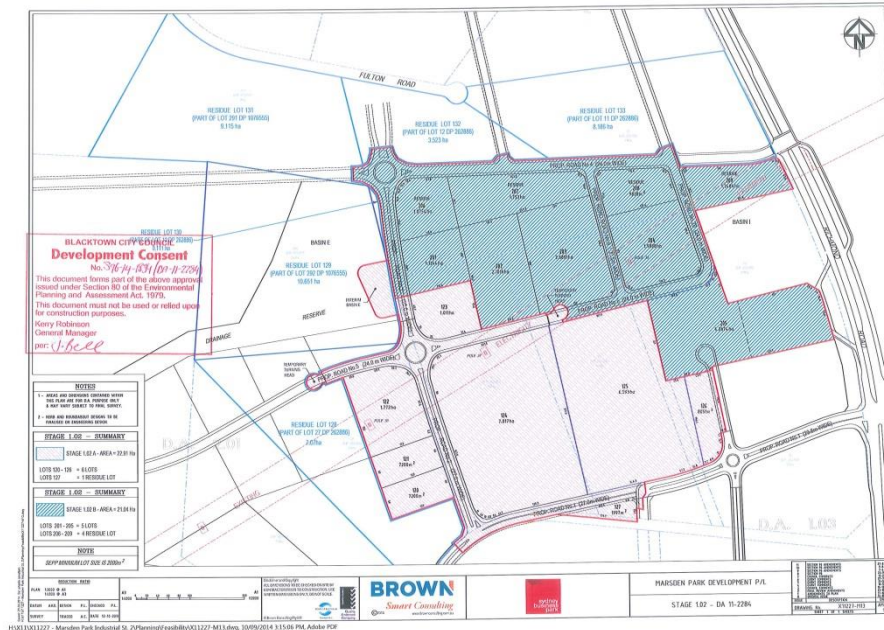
Subdivision Plan Stage 1.02 DA 11-2284 (Modification No. 3)
